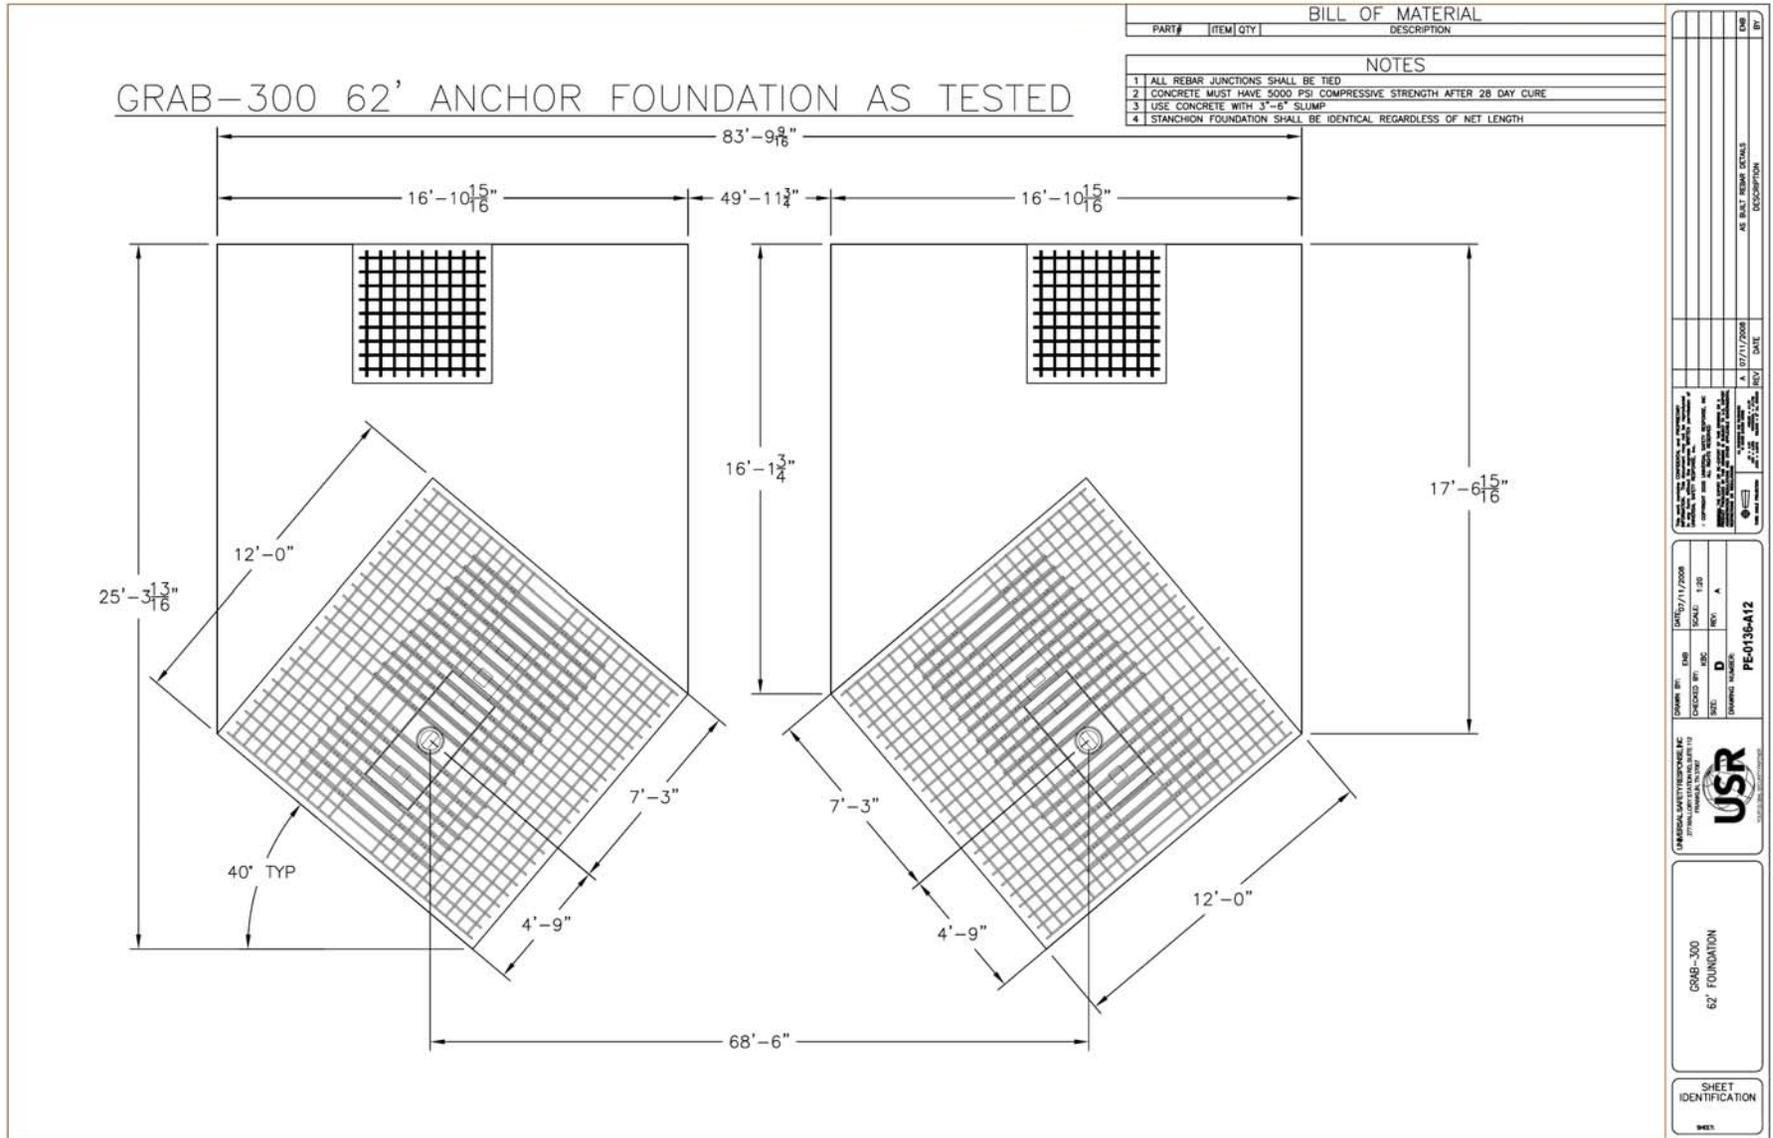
Details of the GRAB-300 62-ft barrier net – anchor foundation.
